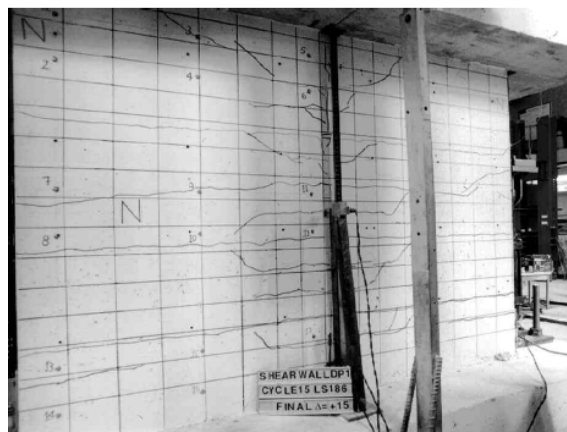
Ultimate damage on flange part showing U-shaped and flexural cracking (Palermo and Vecchio 2002, with permission from ACI publishing).
